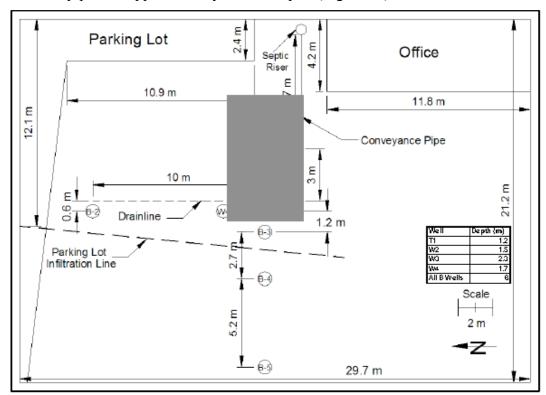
MAS10 site plan. Wastewater flows from the building into a septic tank (riser shown), then west to an infiltration trench. A single catch basin collects stormwater from the parking lot and directs it via buried 10 cm diameter PVC infiltration line into the lawn. The wells are described in Section 4.3. The shaded area is the irrigated area described in Section 4.3.
